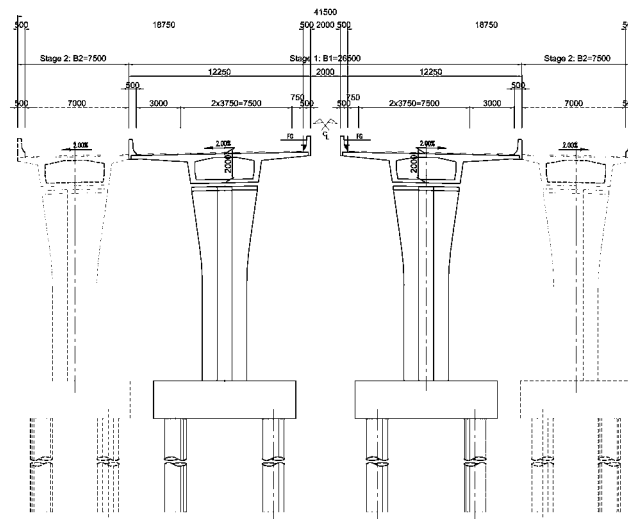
Medium Span Bridge (PC Box Girder L=50 - 90 m) Phase 2.
